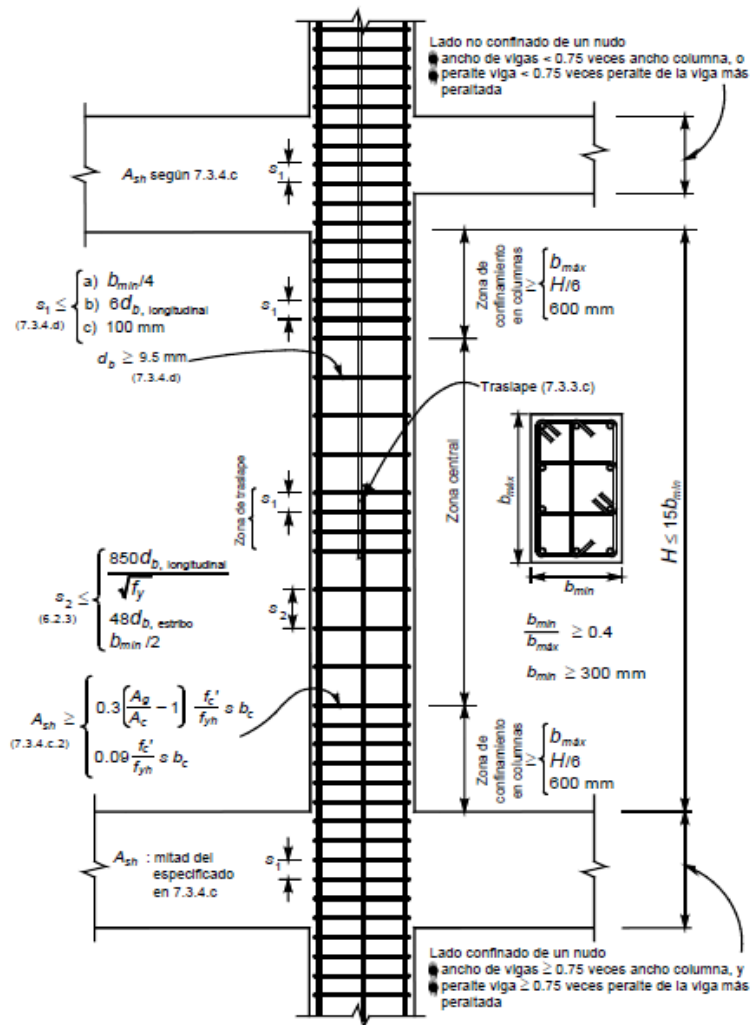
Detailing of members under flexo-compression in a ductile frame.
